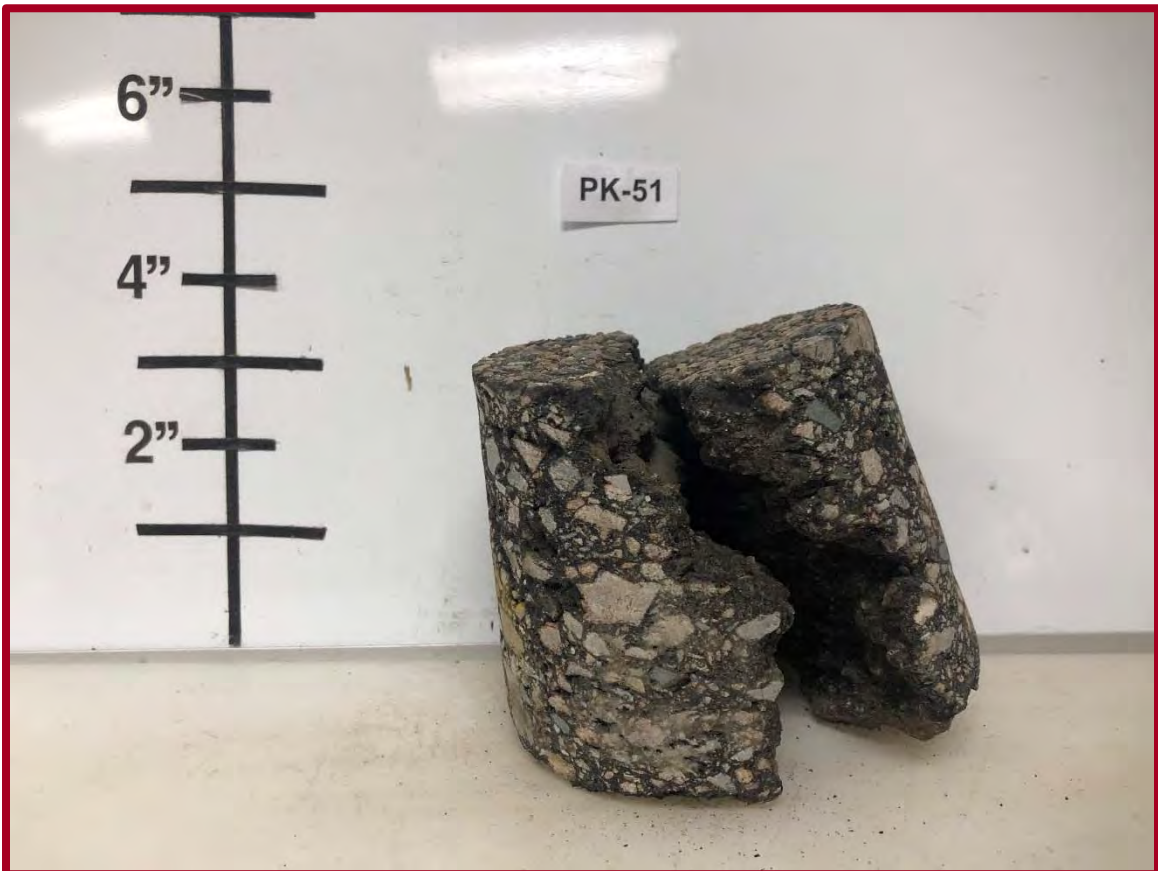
PHOTOGRAPH OF PAVEMENT CORE PK-51
